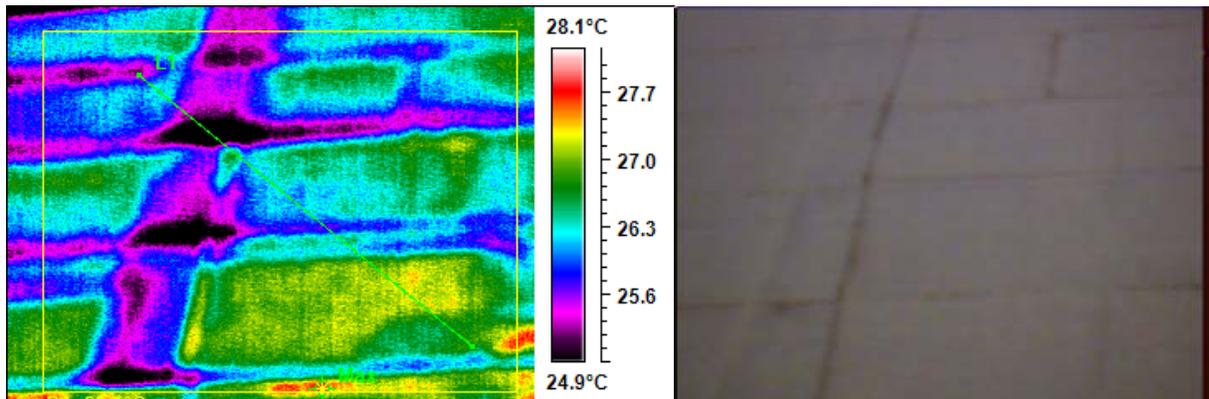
IR image and photo of the production hall roof (in the case of cooling system inside the building – after renovation)
